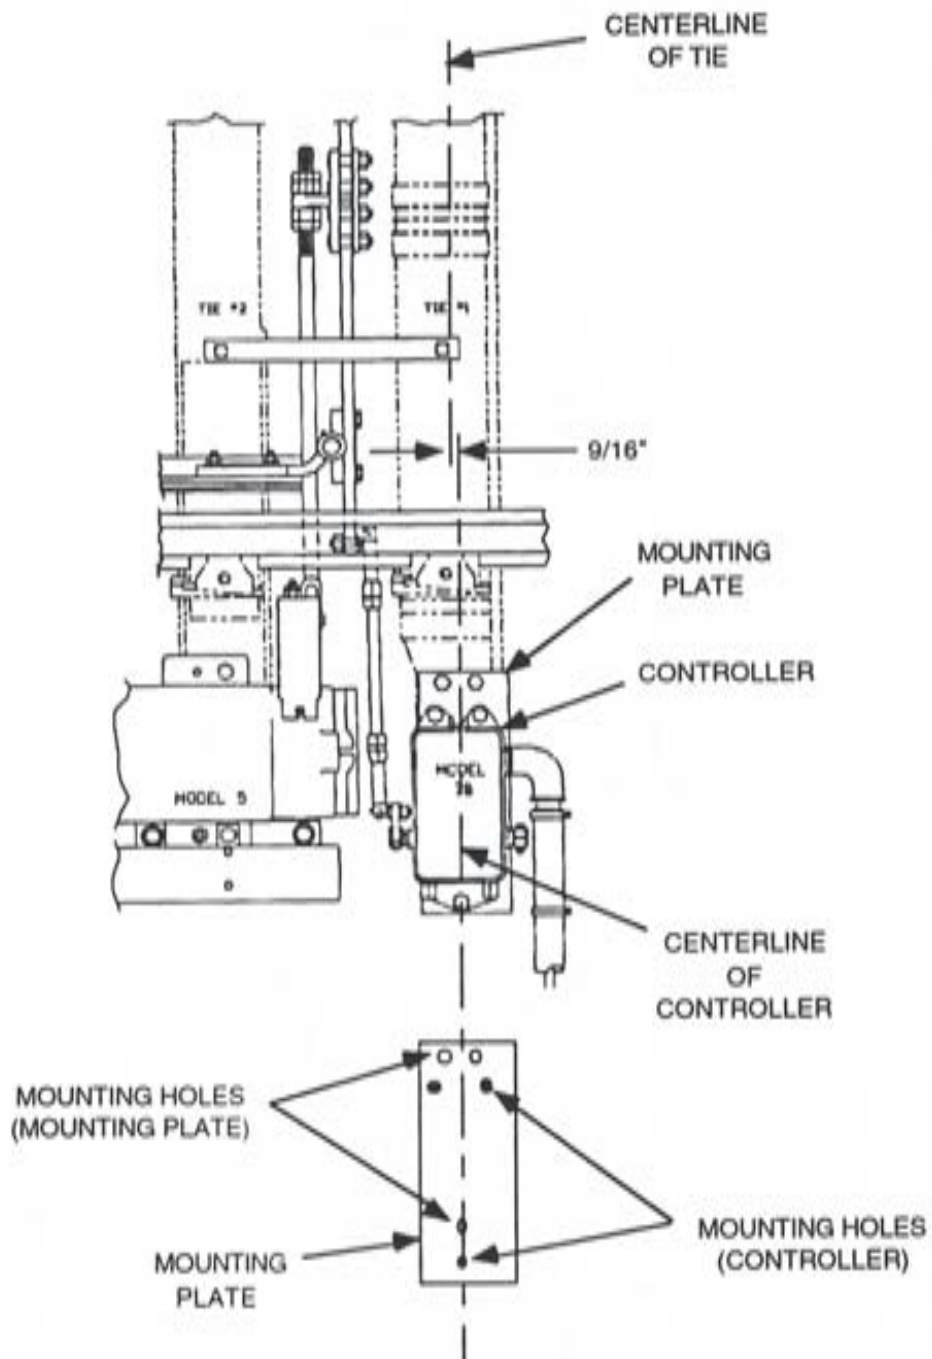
Typical Mounting of Circuit Controller With Mounting Plate
